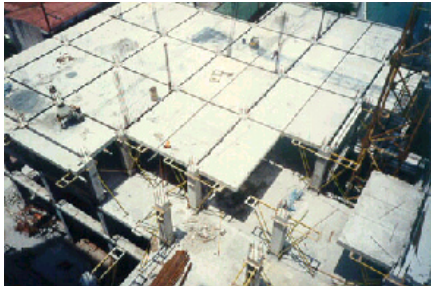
B: A building under construction showing main load-bearing elements: columns and slabs
